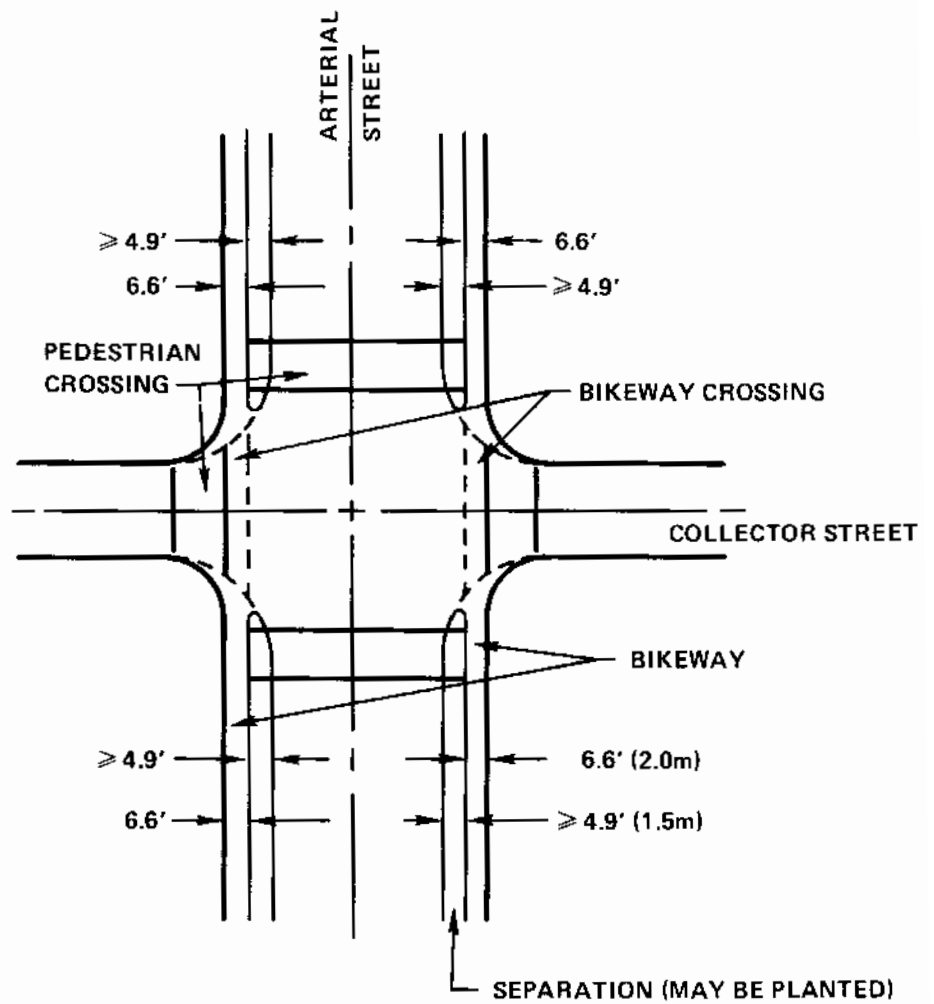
Recommended German Intersection Design: Bikeway on an Arterial Street Crossing a Collector Street. The Bikeway is Separated from Motor Vehicle Traffic by a Strip. (Ref. 26, p. 19).
